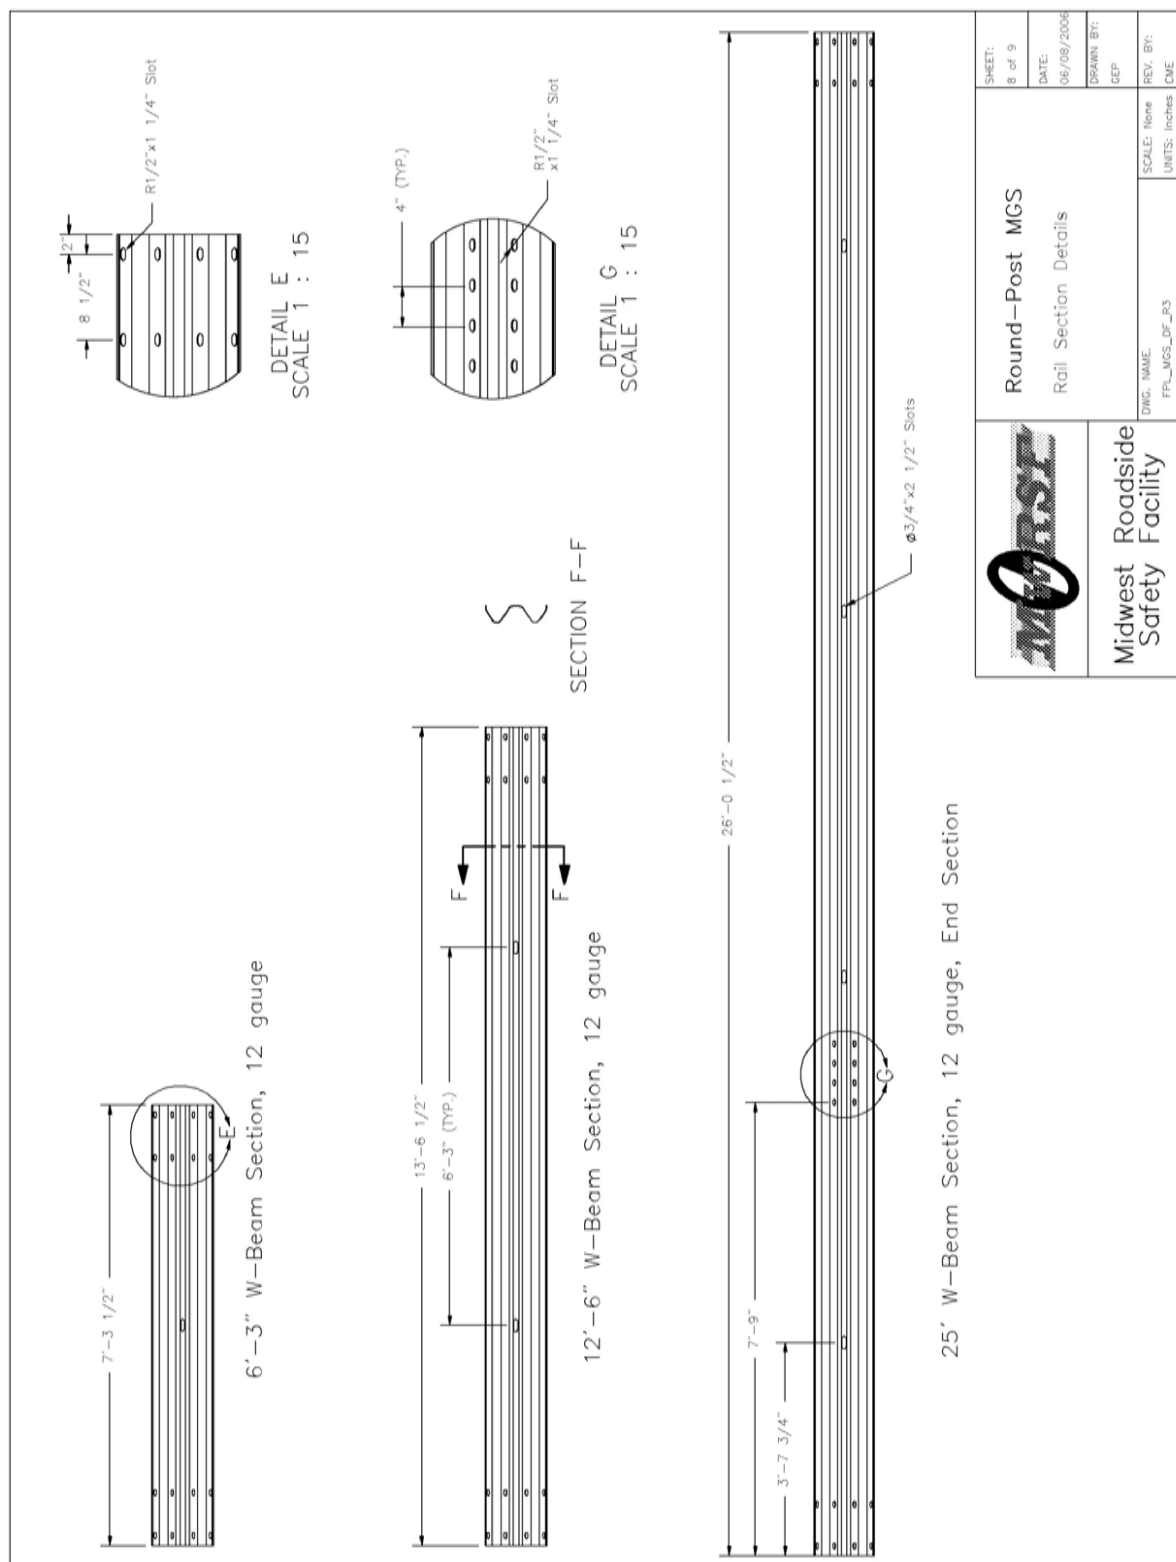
MGS Round Post Douglas Fir English Details – Rail Section Detail
